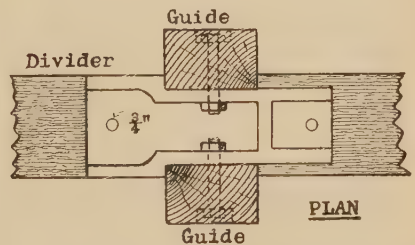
Double bracket designed for use in old shafts without disturbing existing arrangements.
